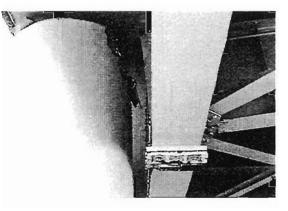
Hanshin Expressway near centre of Kobe: A little higher up same ramp as Plates 6.11 and 6.12, showing girders shifted off column supports and dropped onto deck slab
